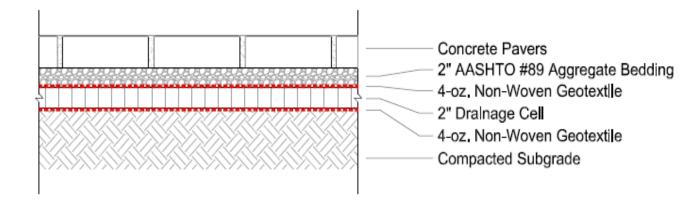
Cross-sectional view of Tremron Shallow (TS)
